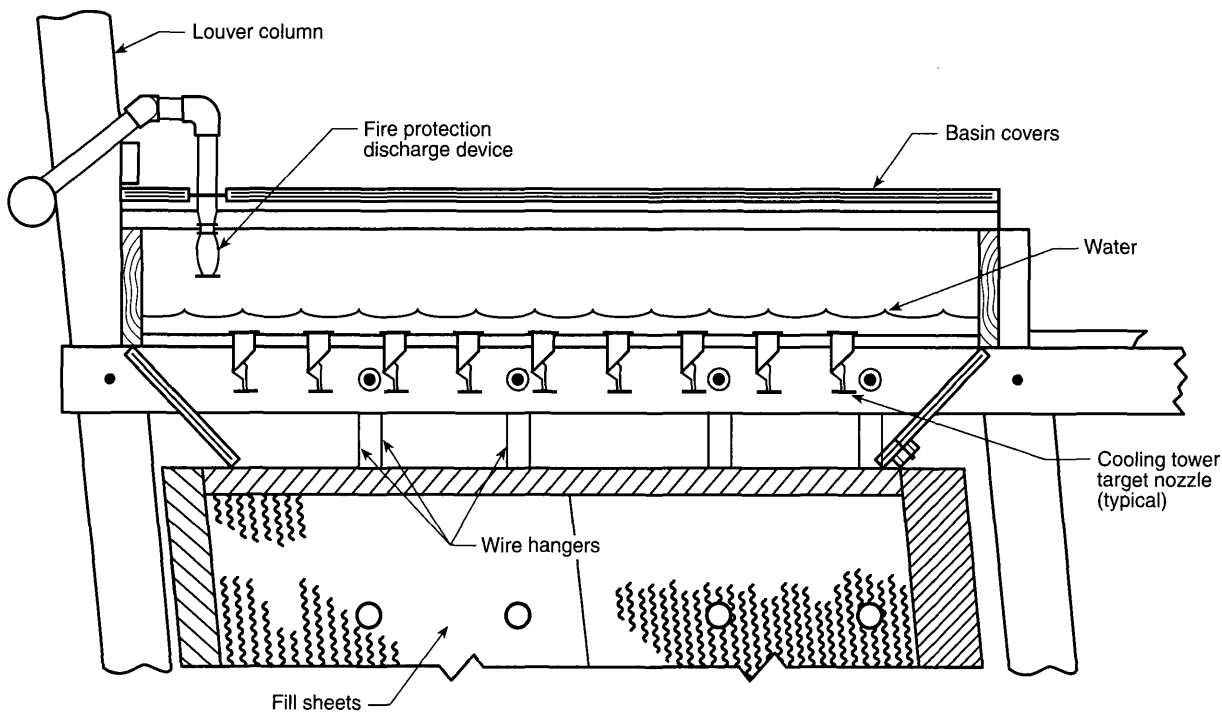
(d) Typical Deluge Fire Protection Arrangement for Crossflow Towers, Illustration 4. [214: Figure A.3.2.3.2(d)]
